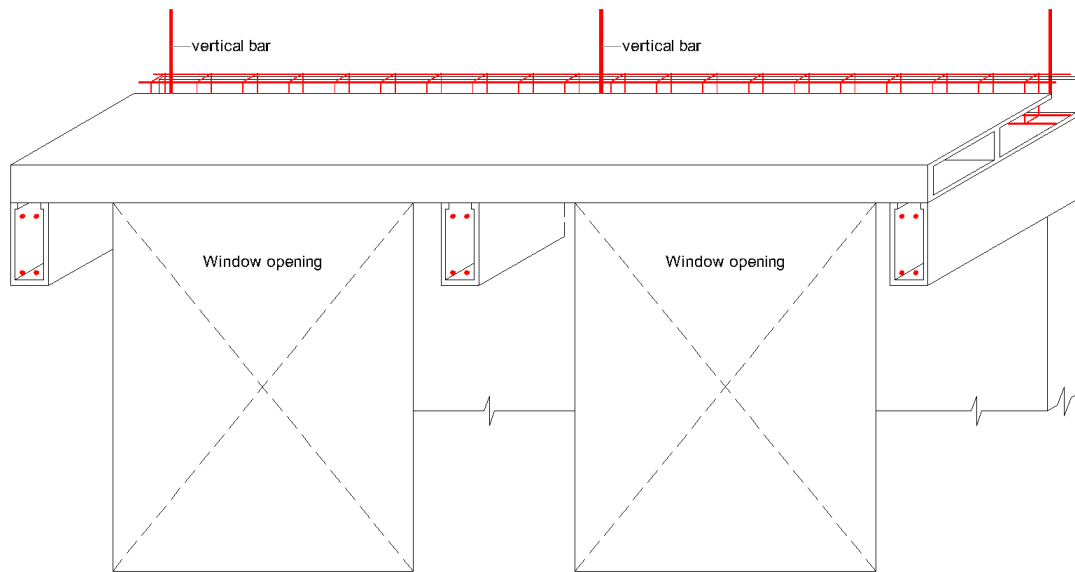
GFRG sunshade panel of 559mm width and required length to be provided
